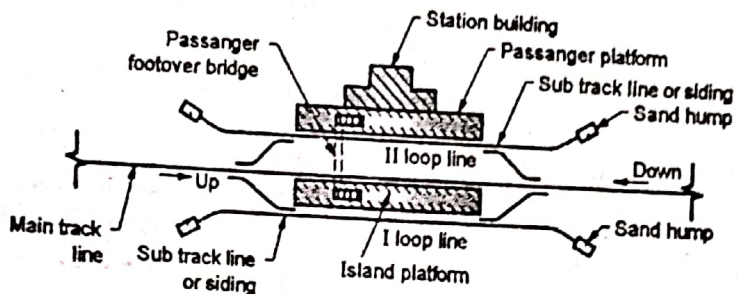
Layout of a crossing type wayside station on a triple line track
